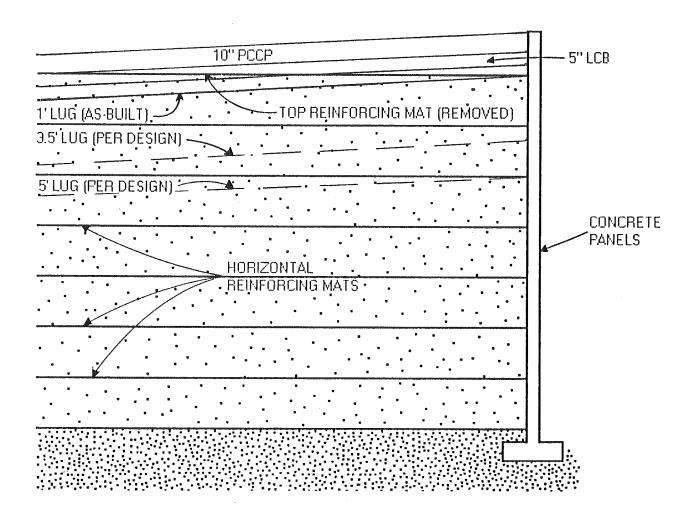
Schematic Diagram Illustrating the Conflict Between the top Reinforcing Mat and the Concrete Pavement (View is a Lengthwise Cross-Section).
